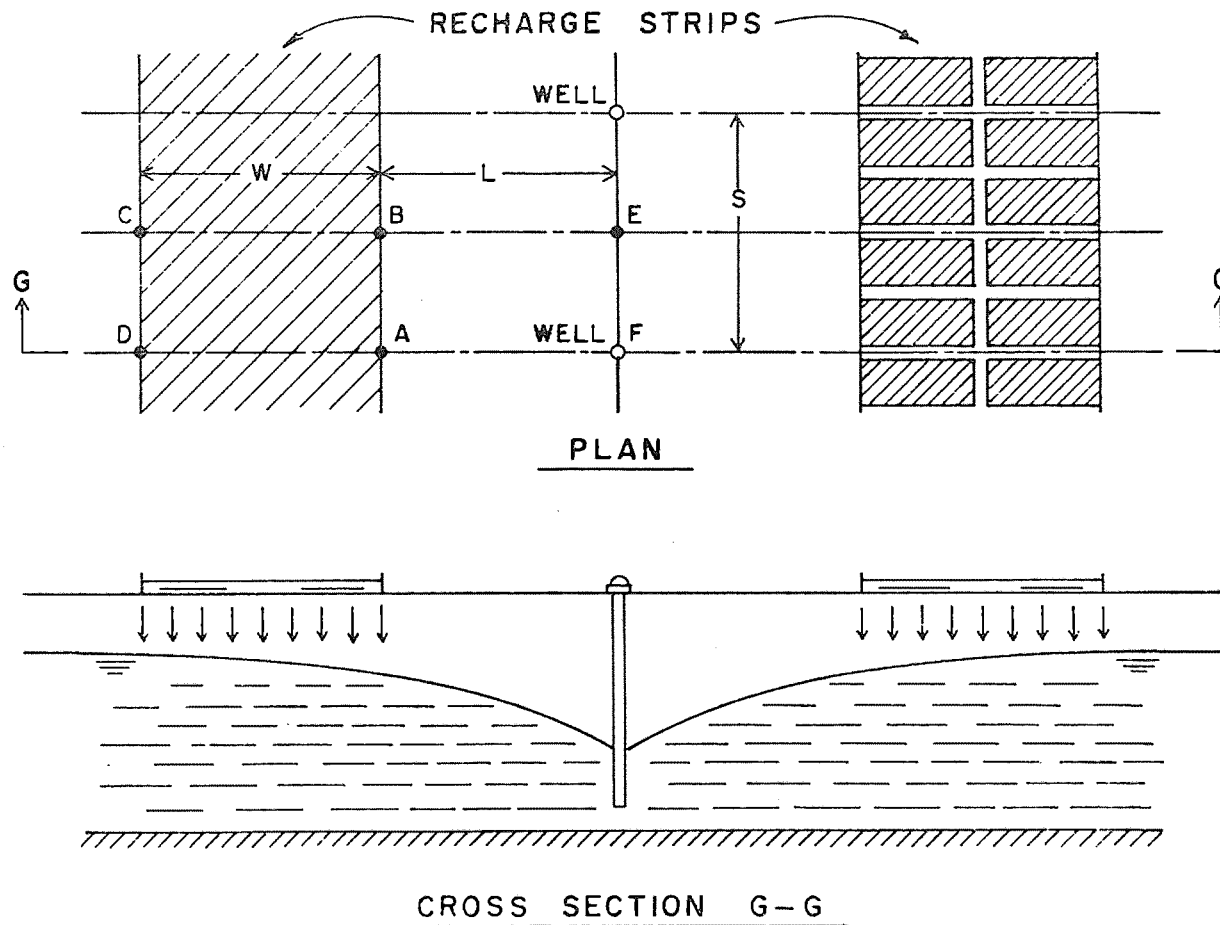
Plan and cross-section of two parallel recharge strips with wells midway between strips.
